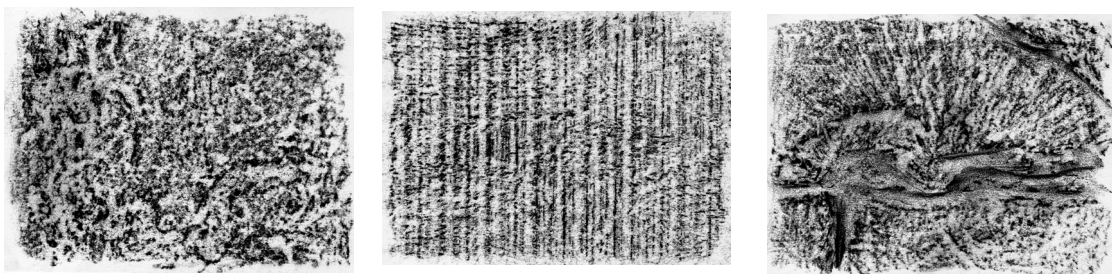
Charcoal rubbings of textural surfaces at *Bryncyn* including concrete flooring; Fig. 7.21 Board marked concrete walls; Fig. 7.22 Slate floor slabs
